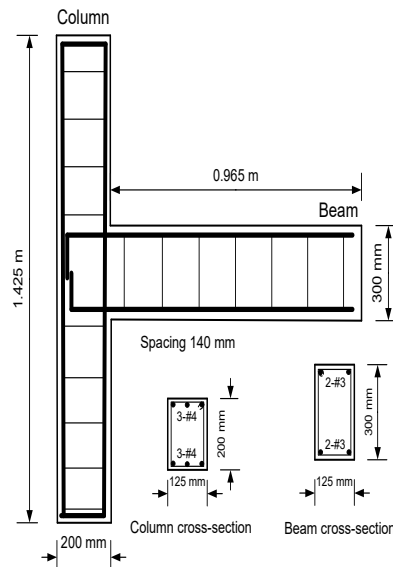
Geometry and reinforcement details of exterior beam-column joint specimen RCNH1 [54]
